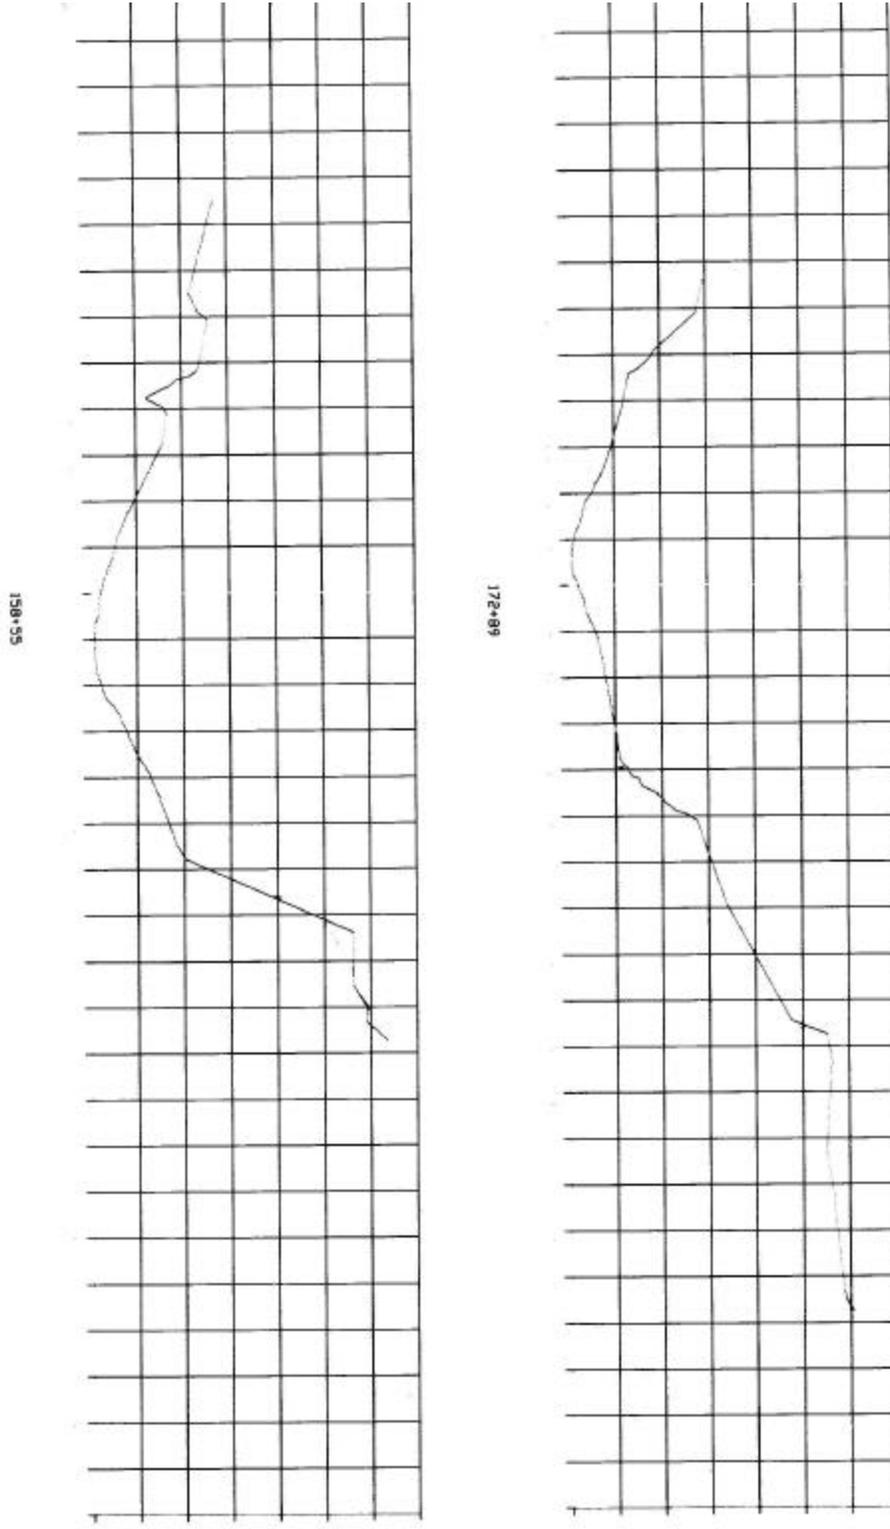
Sabine Neches Canal Cross-Sections
